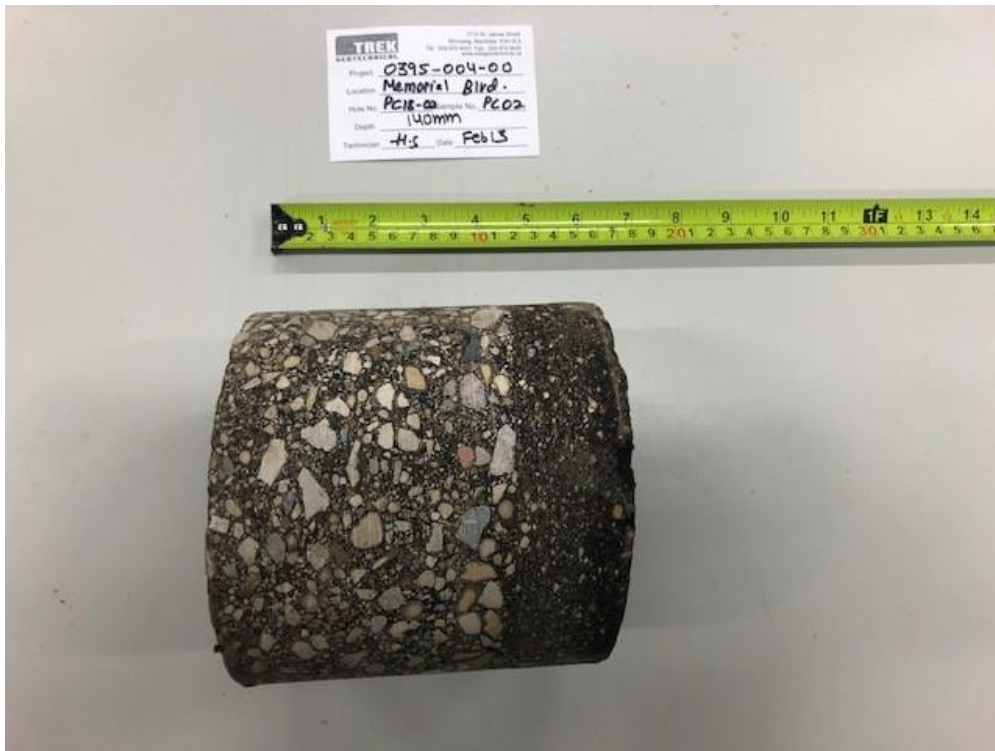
Pavement Core Sample at Pavement Hole PC18-02
